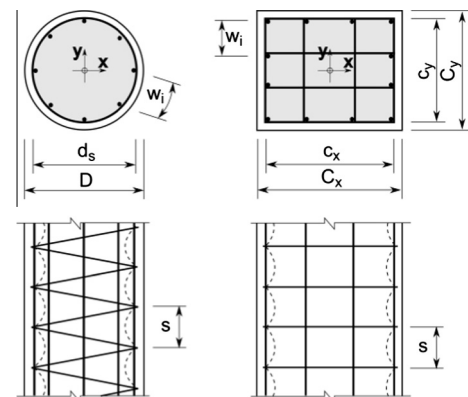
Spirals and ties as confining reinforcement in reinforced concrete columns.
